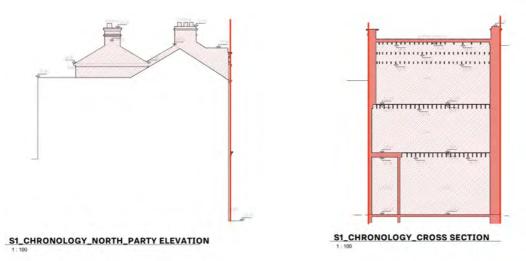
Chronology- North Party Elevation & Cross Section - refer to Appendix I
